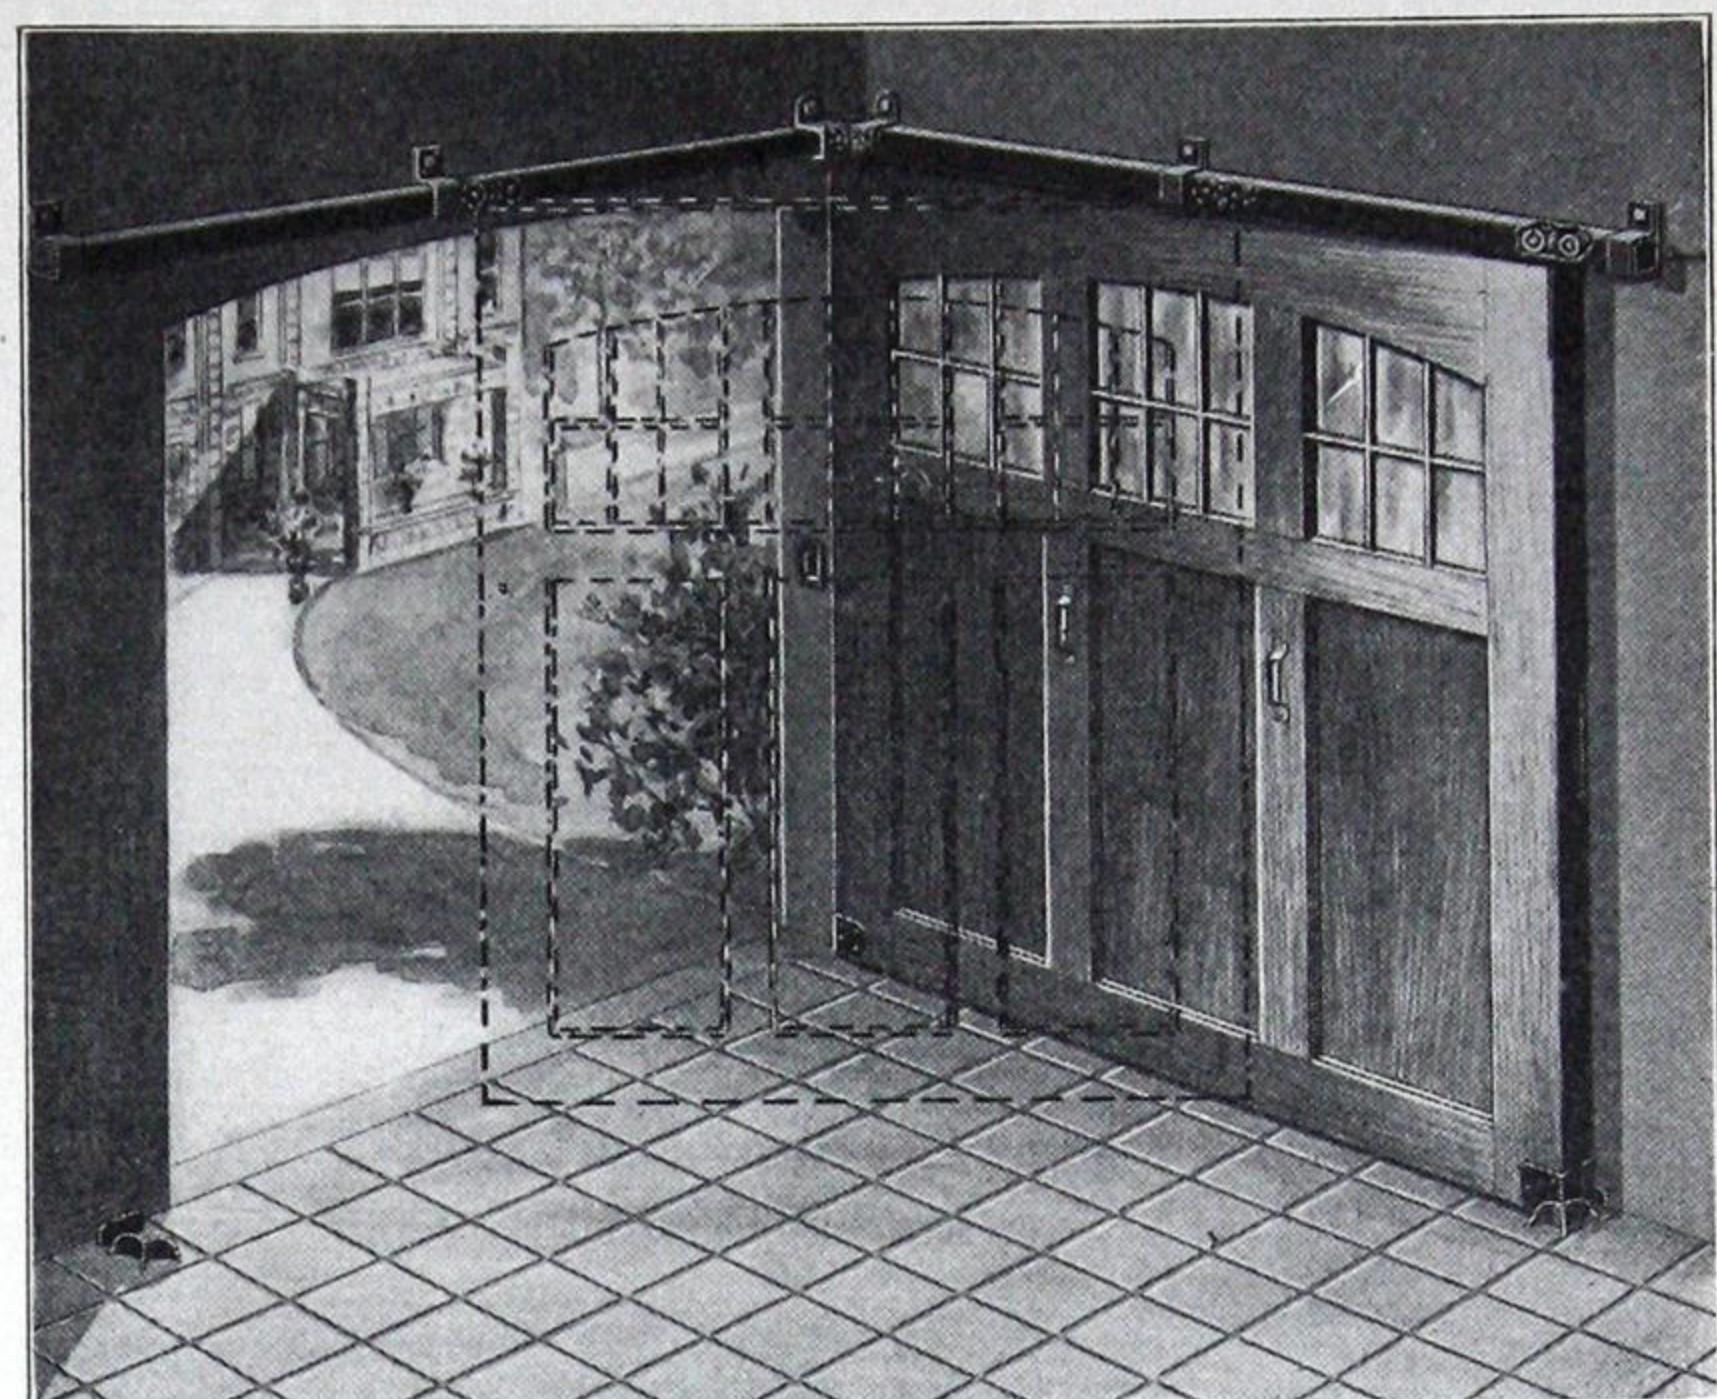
Illustration of interior of garage doorway equipped with Single door "SlydaSyde" CC Hardware.
